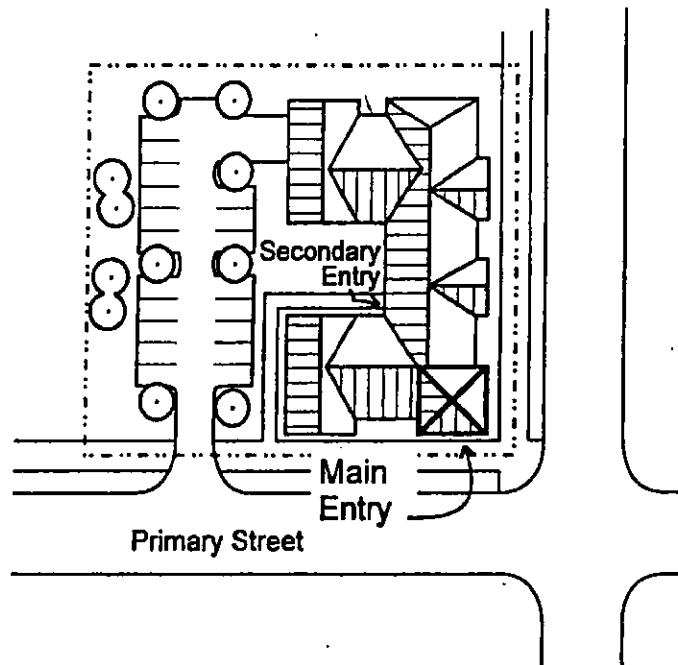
B.2: Site plan showing relationship of building, parking and entries to the street
